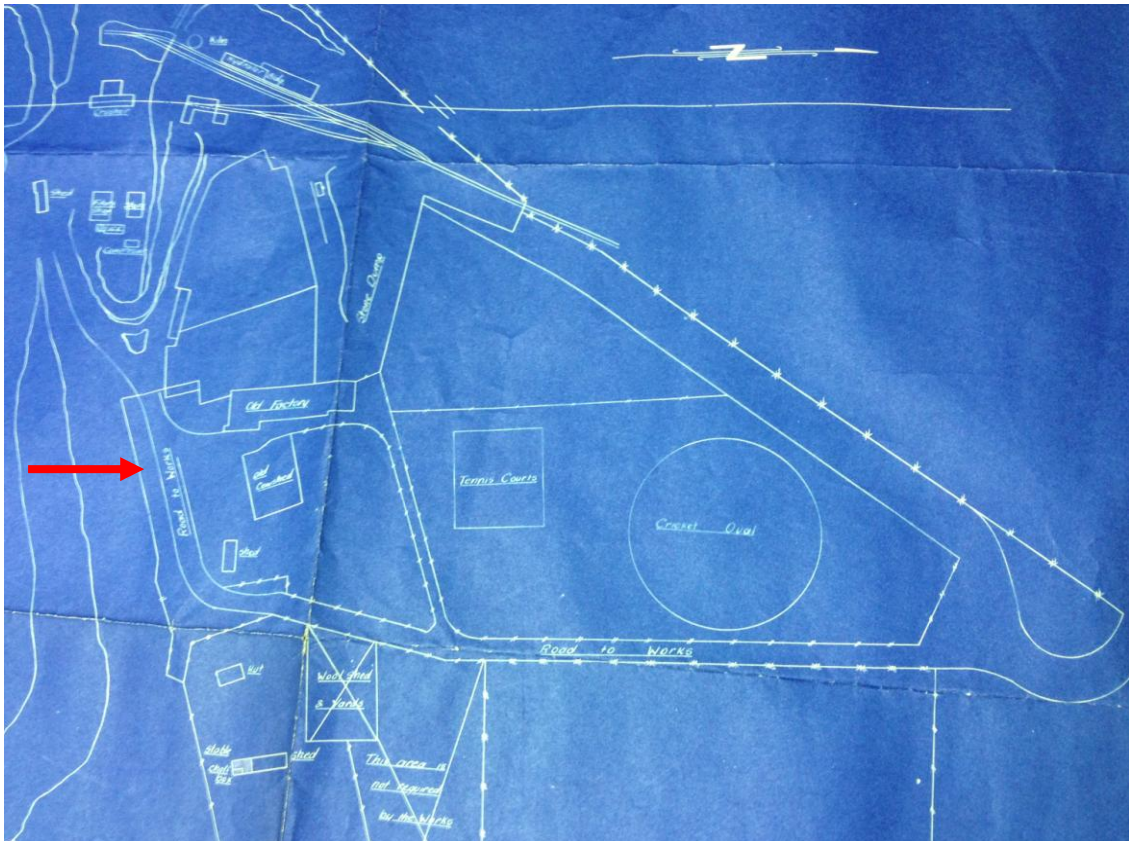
Site plan, 1941: note the 'road to works' (indicated) extending through the farm to the lime processing area
